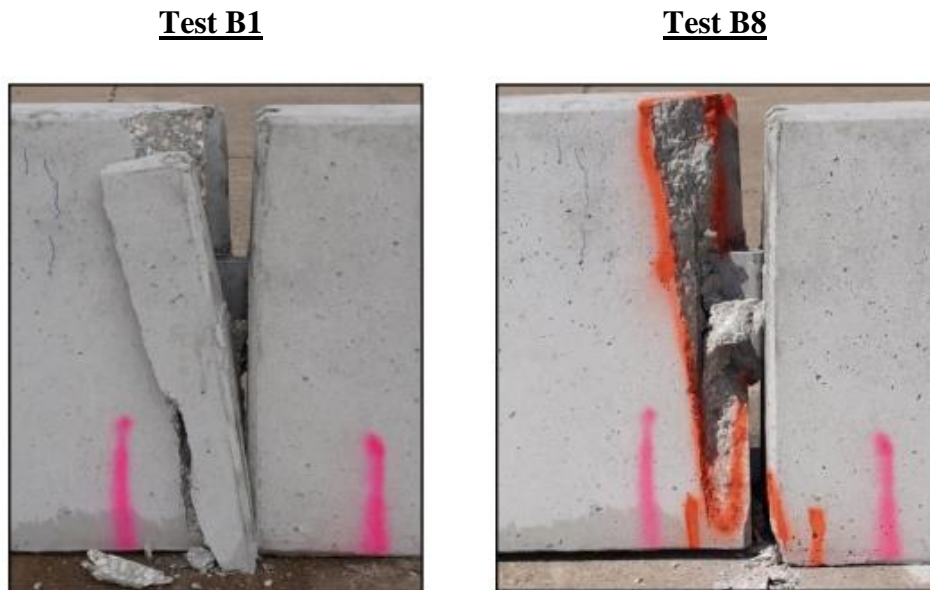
Damage observed near the joint between the single slope barriers C and D after the component testing performed to evaluate the barrier strength.
